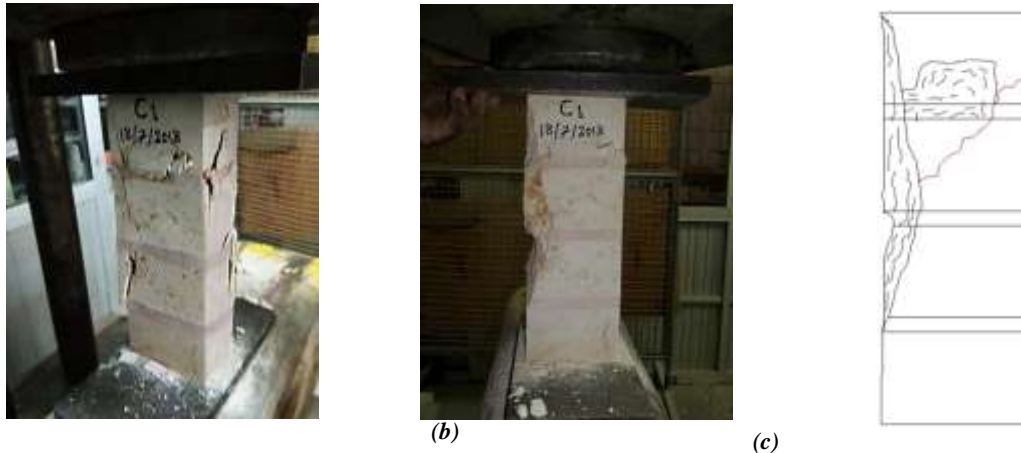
shows the typical failure mode of the strengthened masonry prisms with nanolime, (a): during failure, (b): failure mode, (c): a sketch for failure patterns (semi-conical break, diagonal shear crack and spalling).
